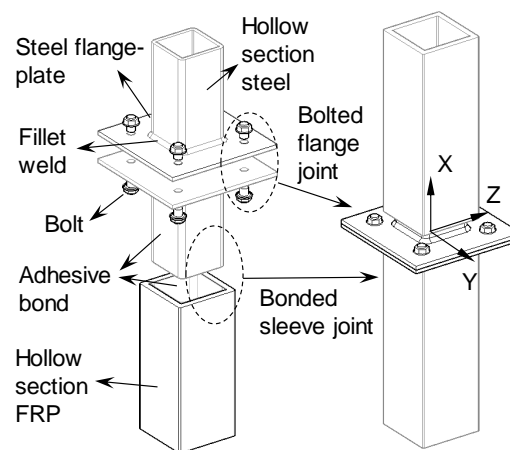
Configuration of the proposed splice connection for hollow section FRP member.
